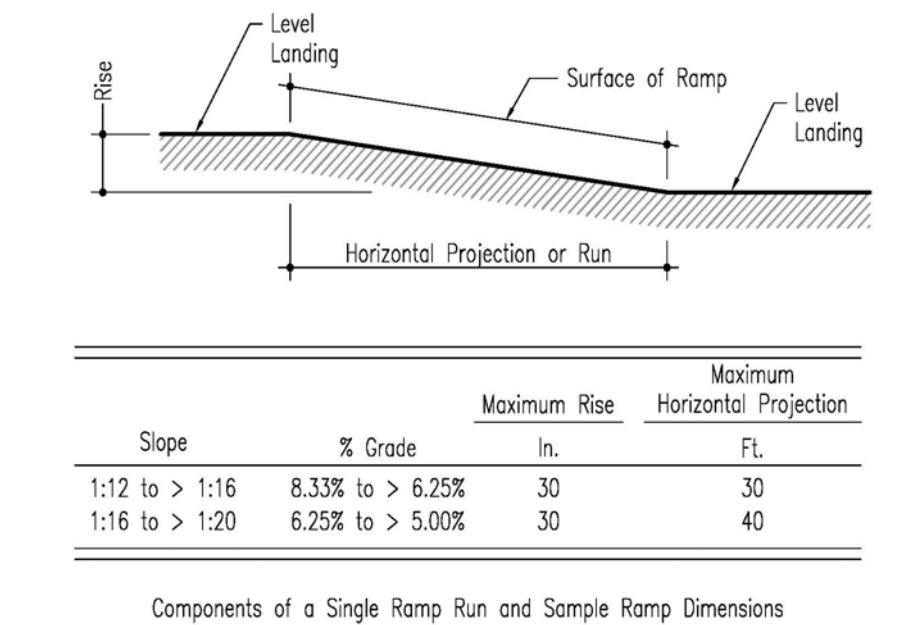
Maximum Spacing of Resting Intervals on Shared Use Path Structure Ramps
